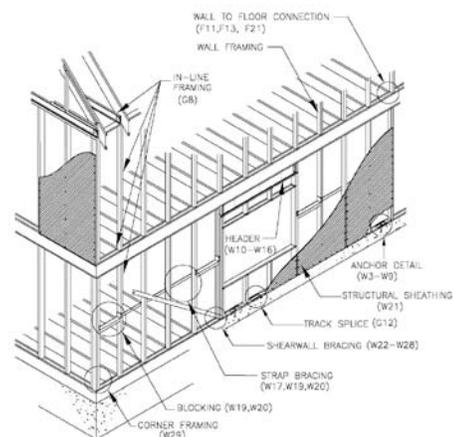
Typical framing details for two-story cold-formed steel framed building [1]
